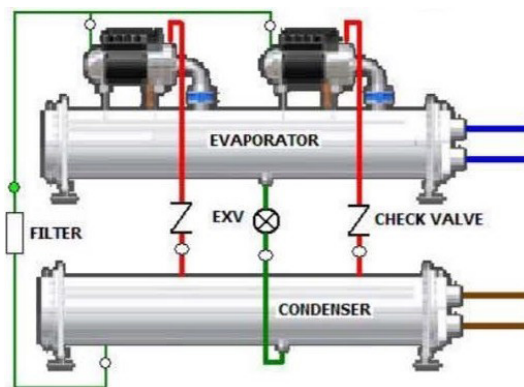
Turbocor Oil Free Water Cooled Chiller
